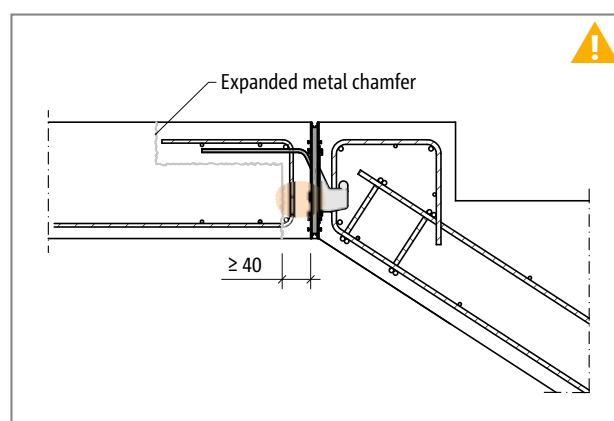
Schöck Tronsole® type T: Installation in combination with construction joints at floor edge, compression joint on floor side
